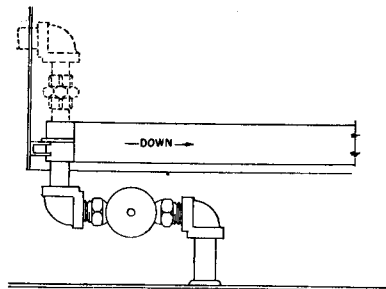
Using Straightway Valve for Up-feed supply with Alternate Down-feed connections using pipe union without Valve.
